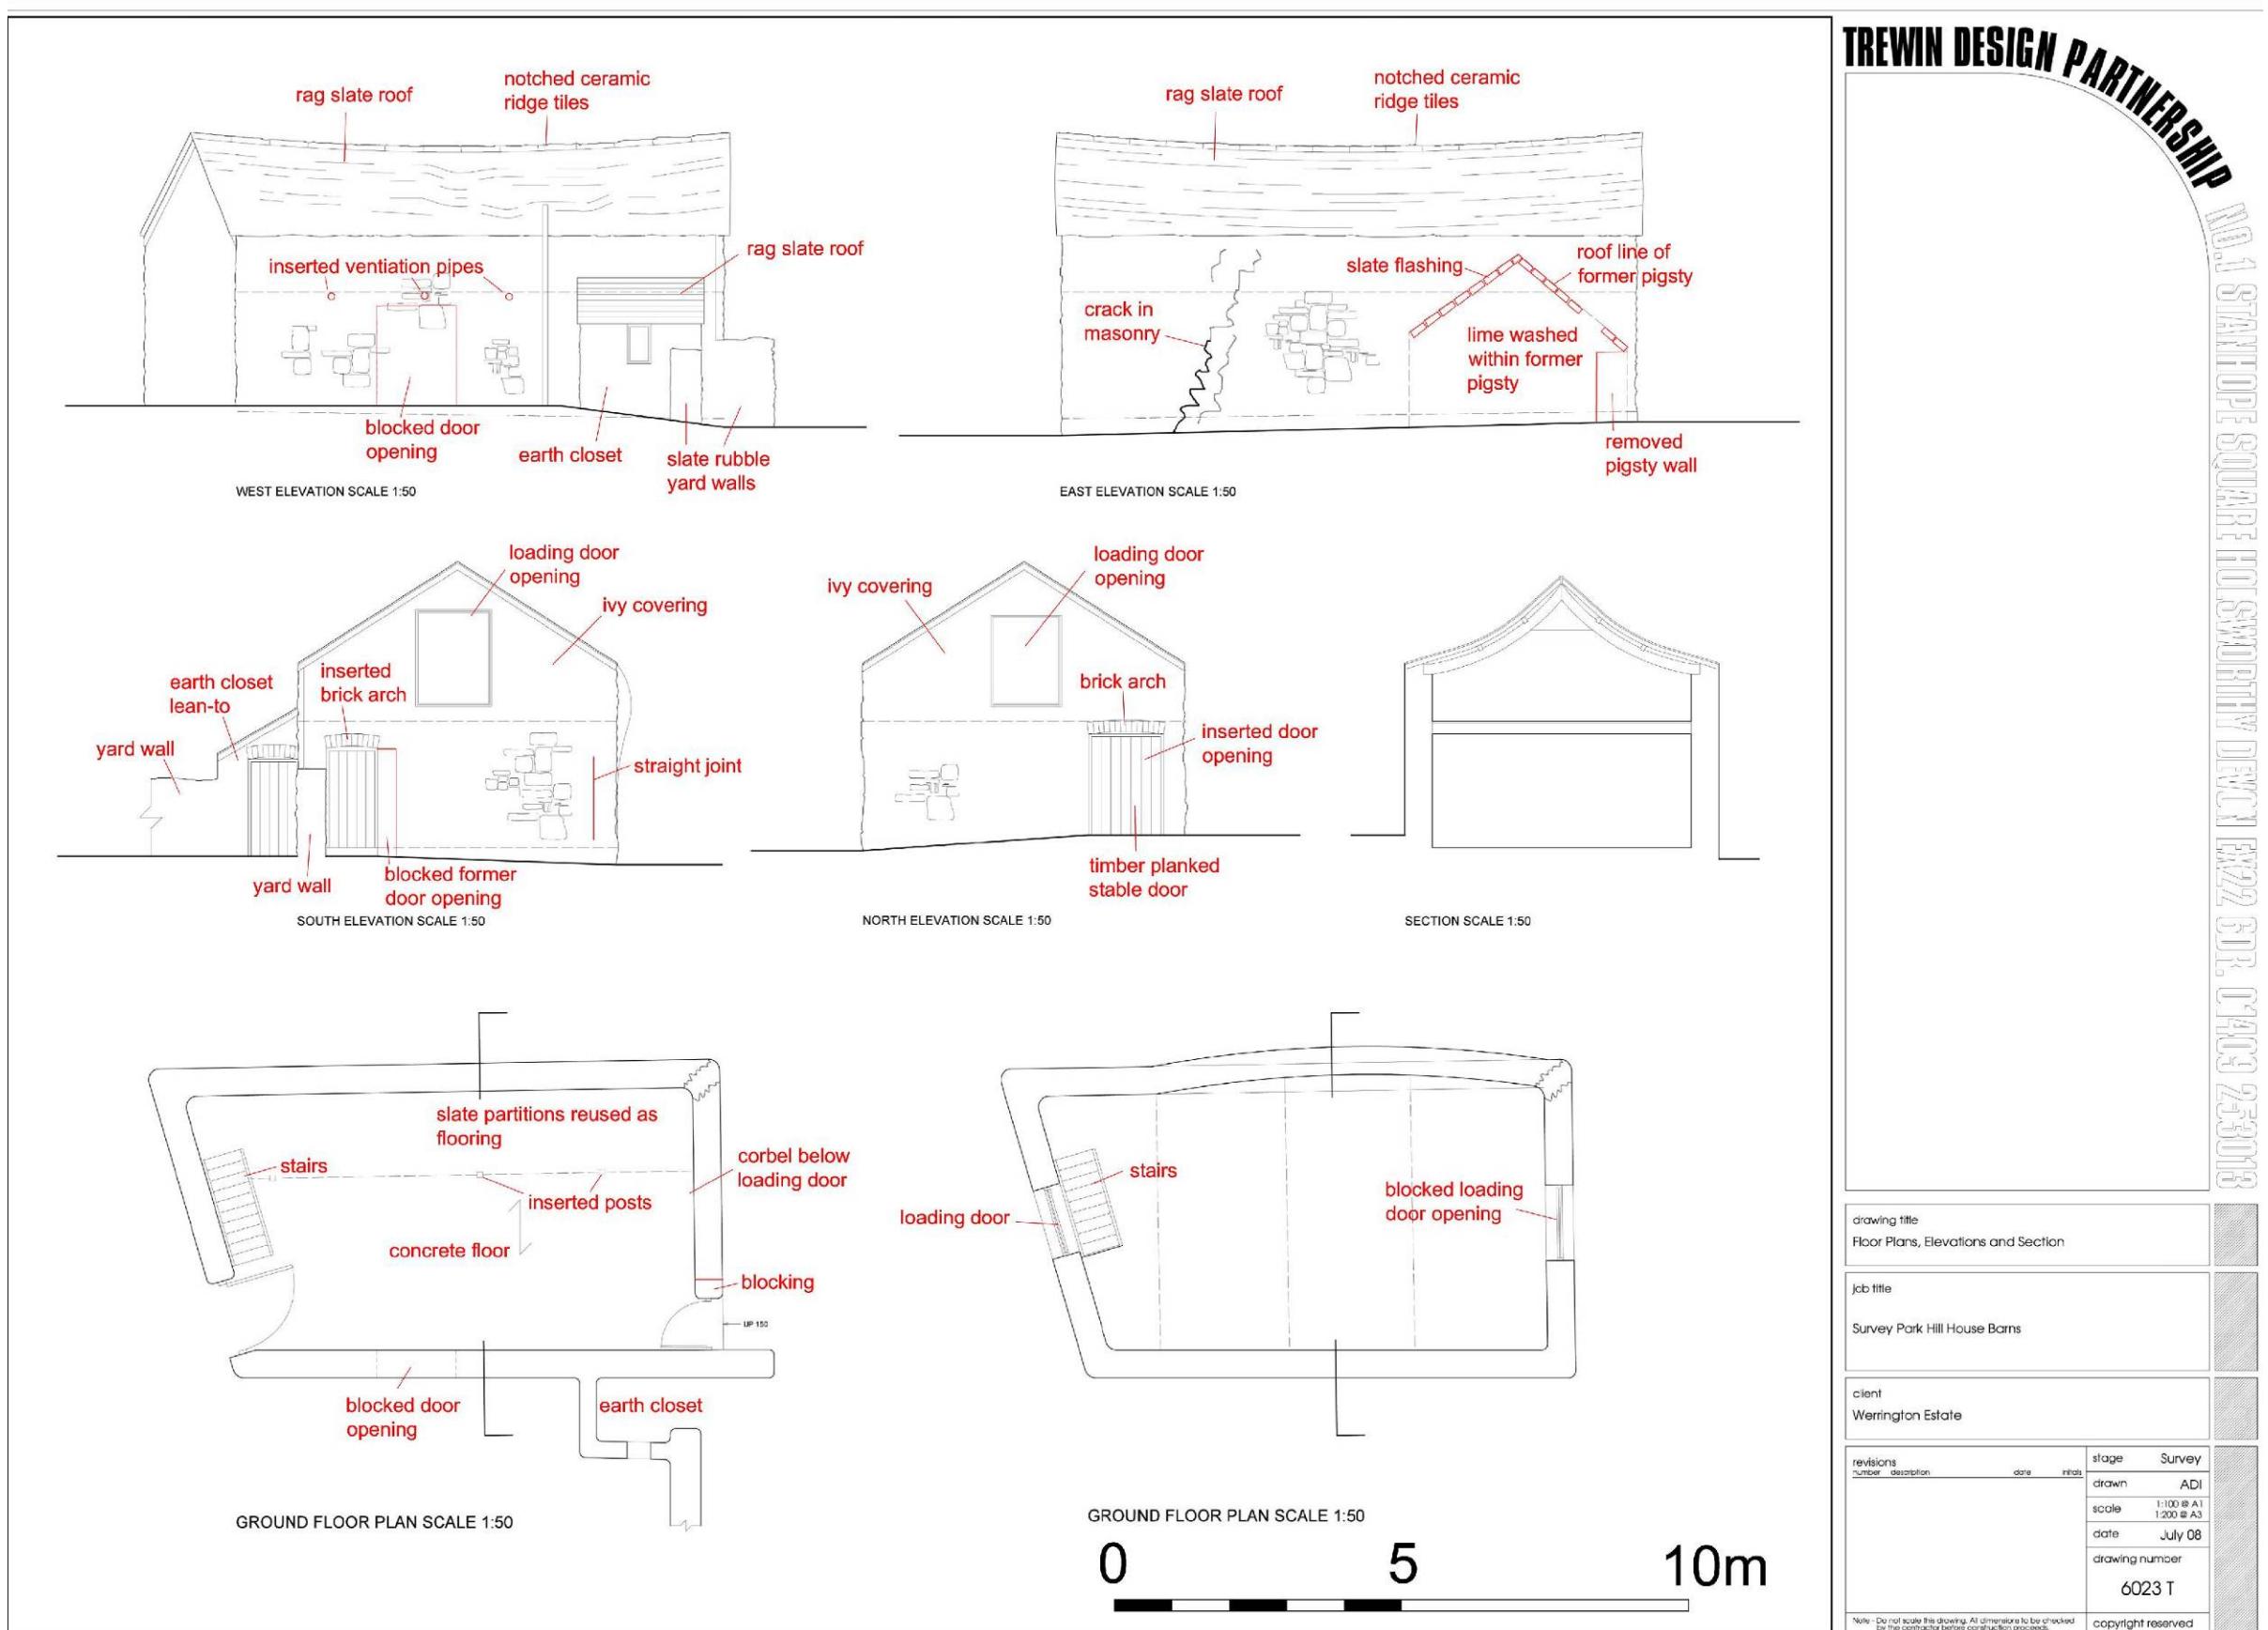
Building 1 annotated elevations and plans (original drawing supplied by Trewin Design Partnership)
